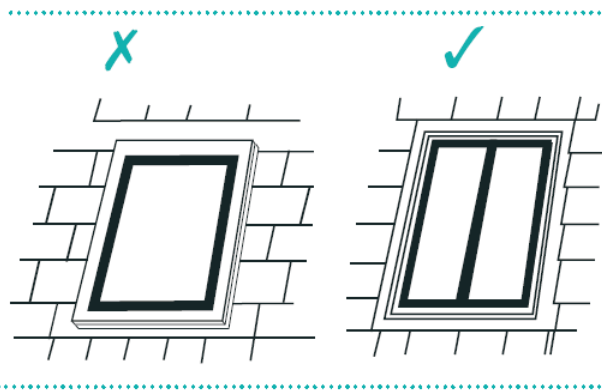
Flush fitting ‘conservation’ style rooflights sit more comfortably within roof slopes
